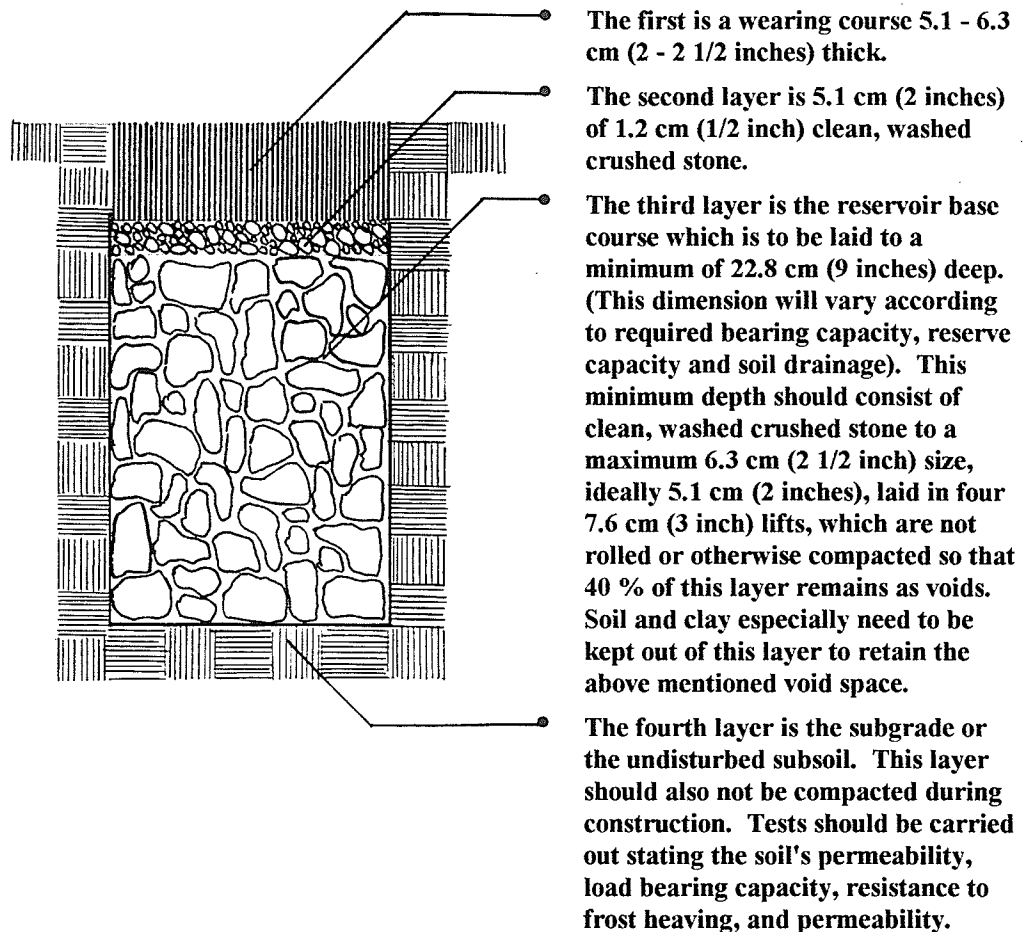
TYPICAL POROUS PAVING SECTION
